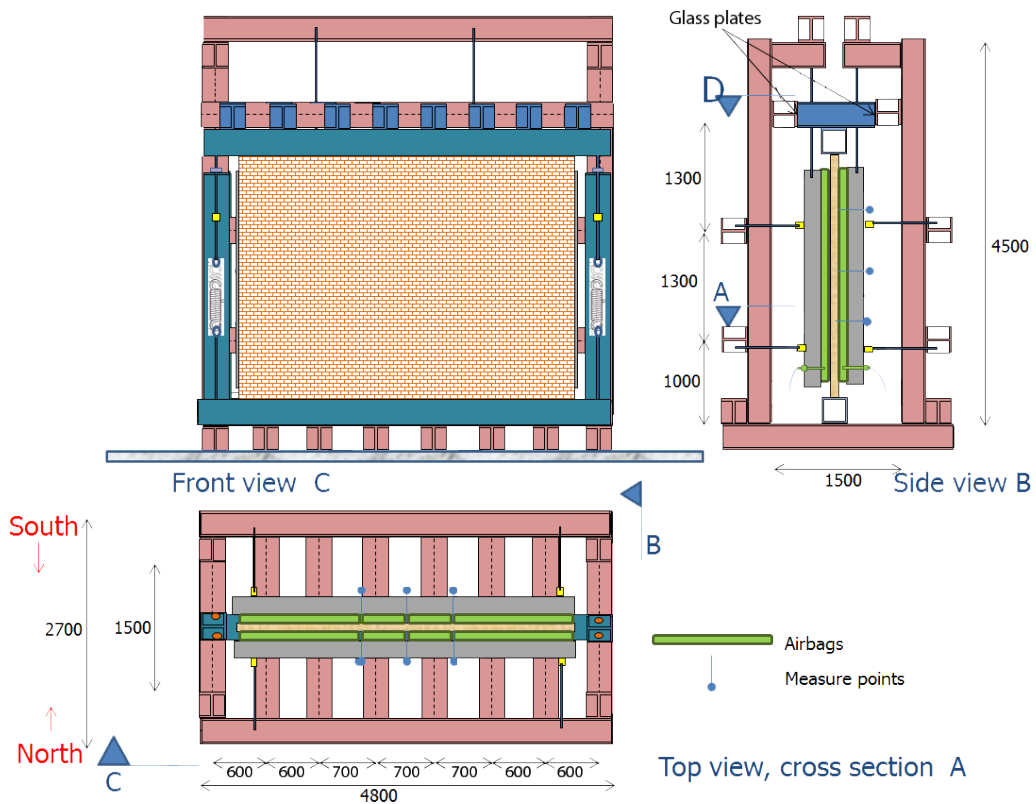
Test set-up for squat walls subject to two-way out-of-plane cyclic tests.
